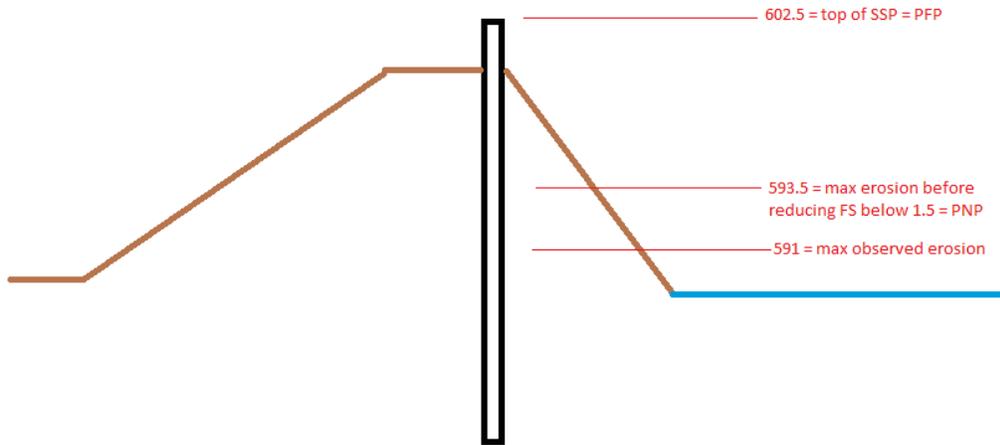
Cross section of PFP and PNP elevations south of 47th Street
